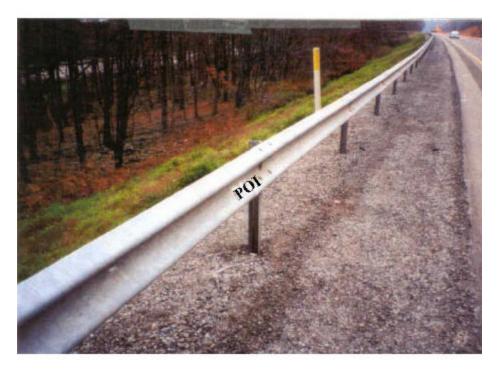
Guardrail on the South Shoulder of the Westbound Lane. Note: The guardrail is marked POI to designate where the apparent point of impact with the victim took place.
